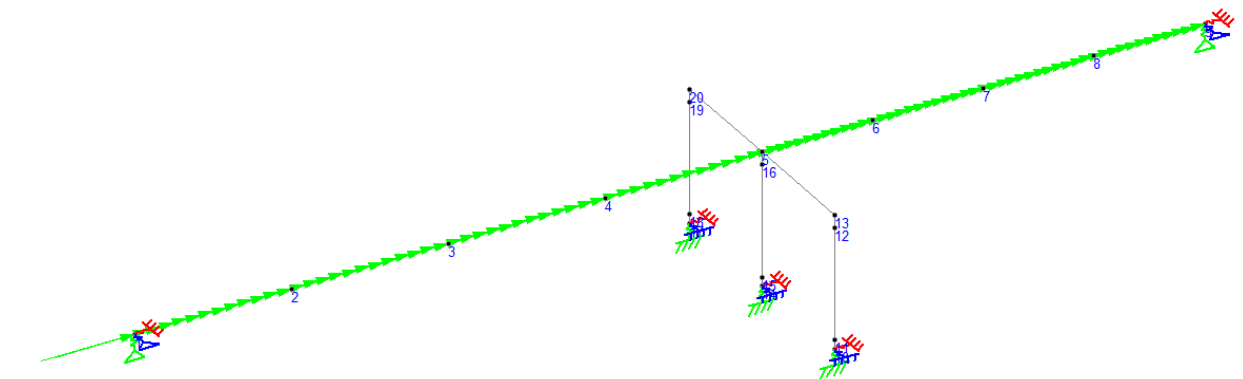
Bridge Model under Longitudinal Load of 100 kip/ft
